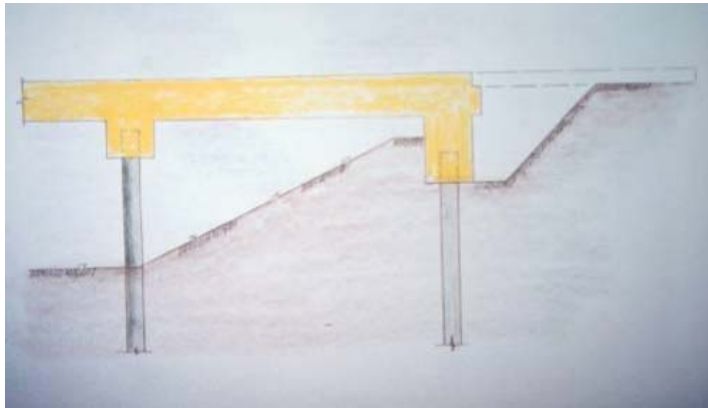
Step 2: Excavation for abutment pile cap
